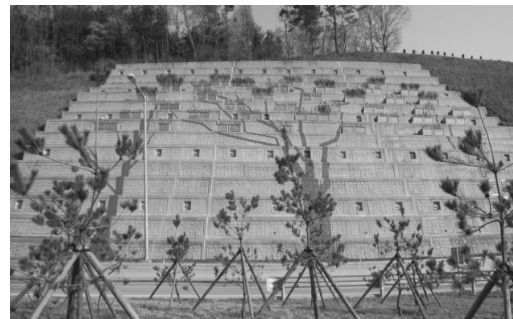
Site II after test construction (terraced retaining wall of cut slope in Shinyang IC).
